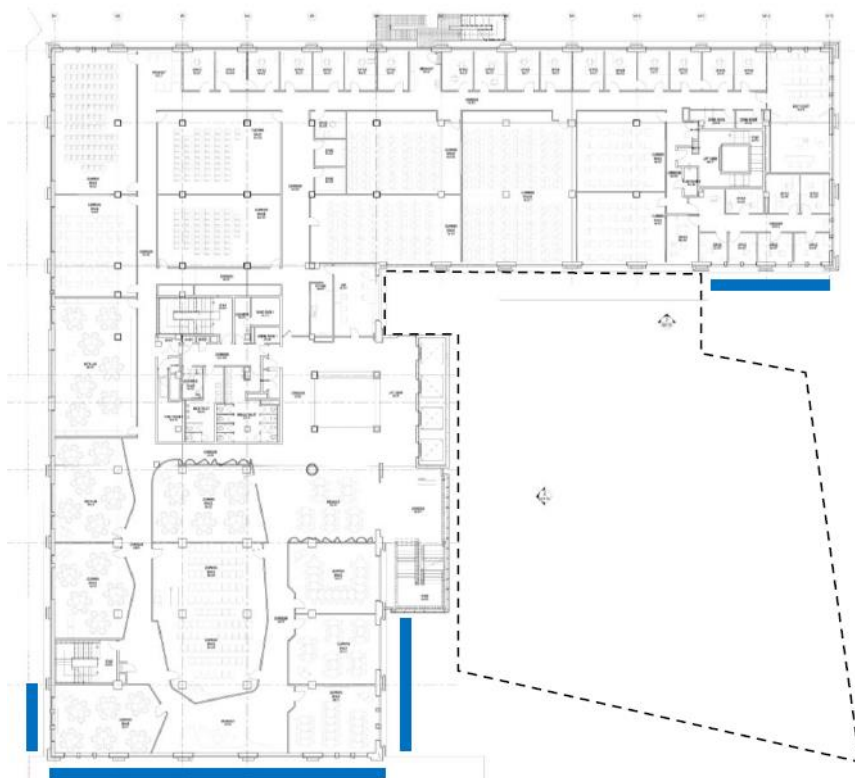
Extent of proposed window replacement (plan prepared by Lyons)
